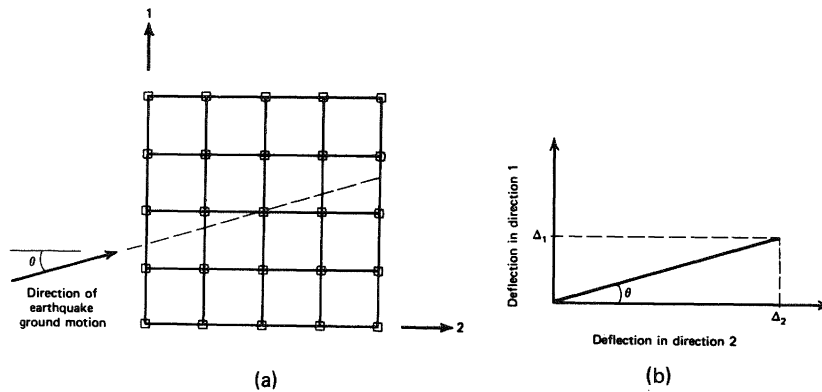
General Direction of Earthquake Loading on Building (6) (a) Plan of Building, and (b) Horizontal Deflection of a Floor
